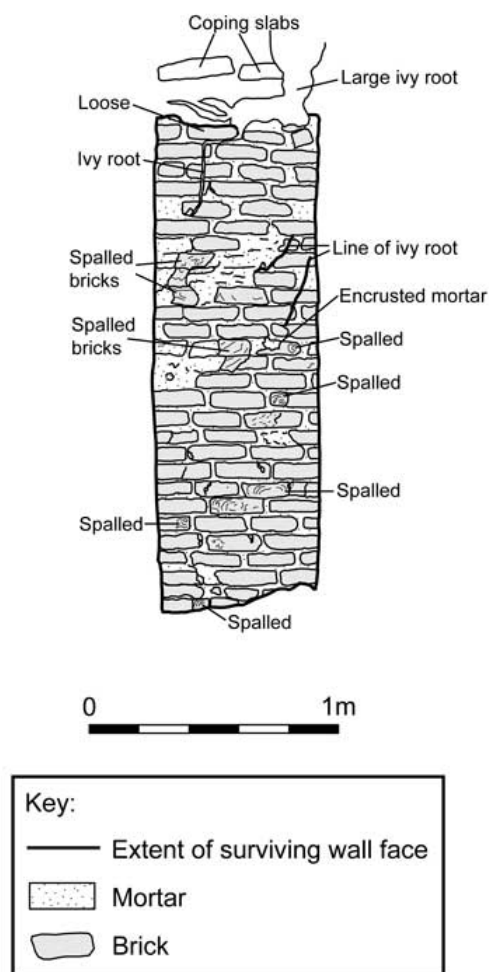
Structure 2, East Stair: Elevation e (South-facing Revetment)
